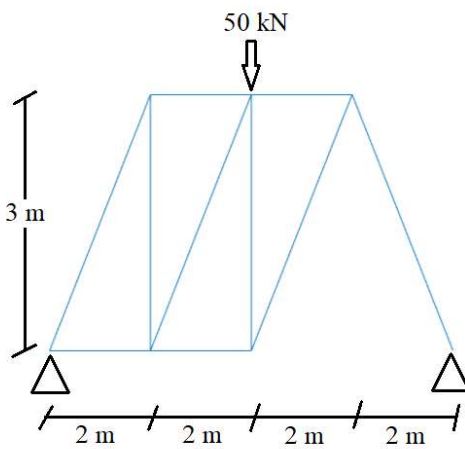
Optimal Truss Structure of Twenty-One Elements Truss Subjected to First Load Case
